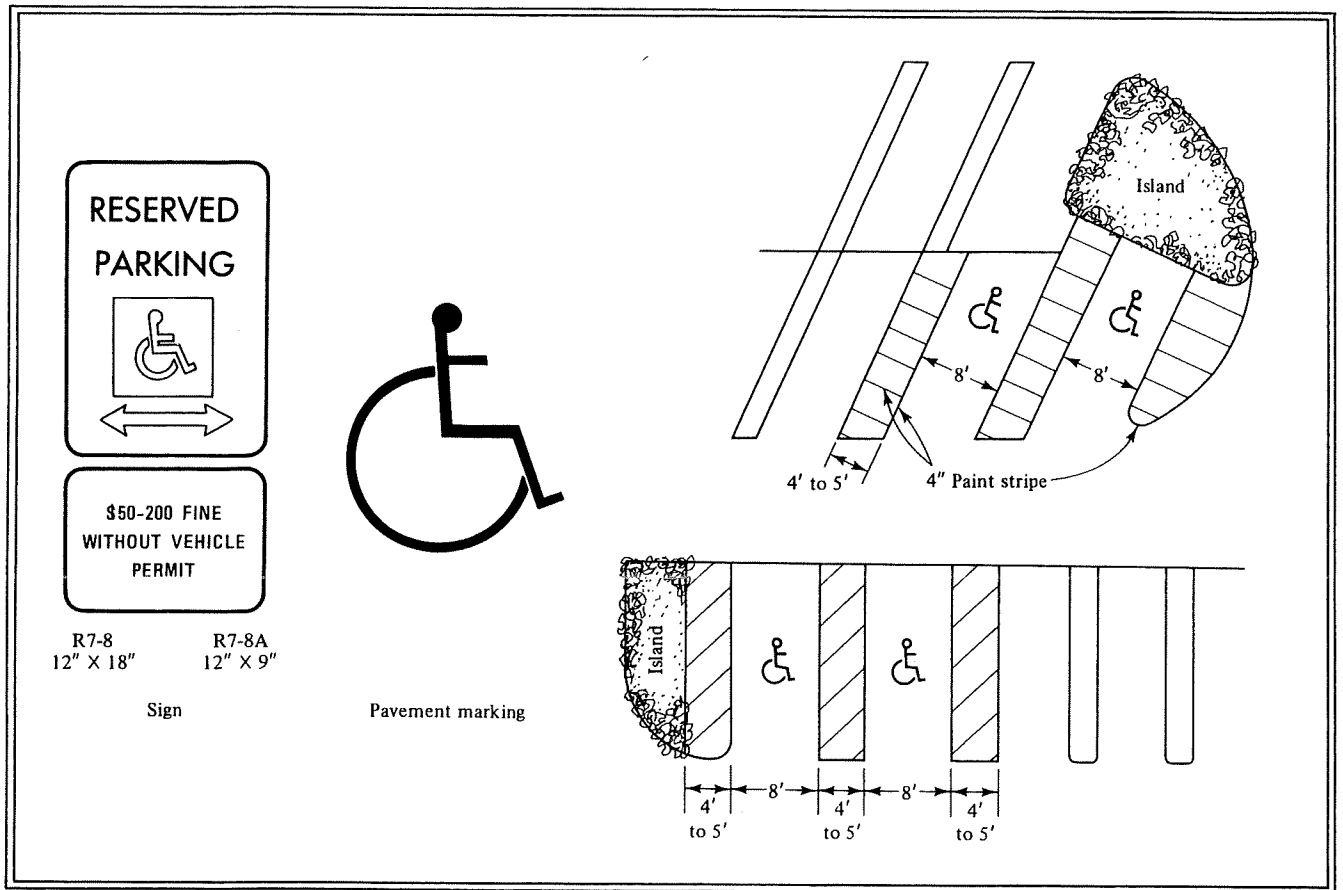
Handicapped signing, pavement marking and parking stalls
